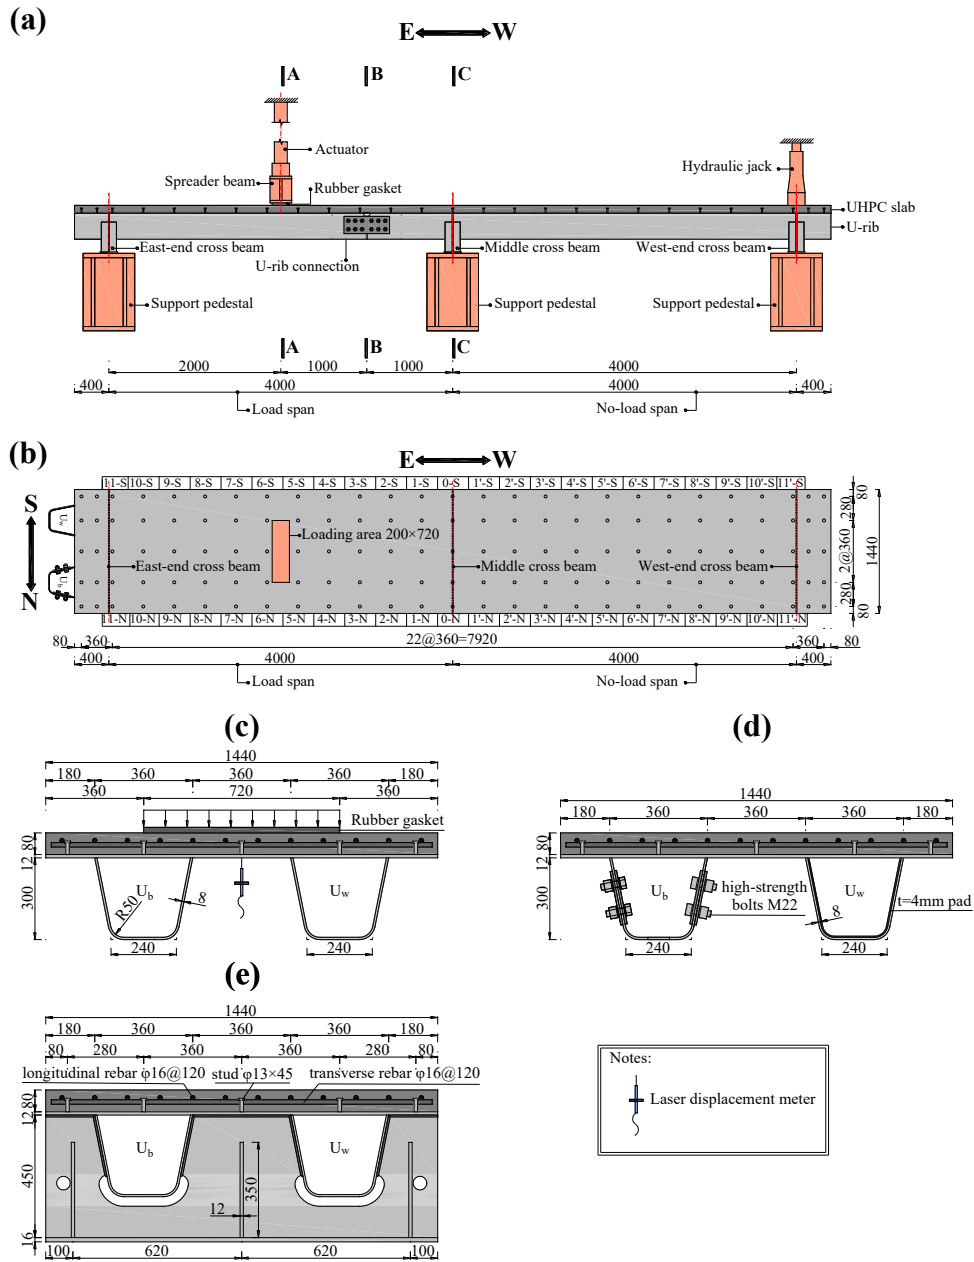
Details of full-scale specimen (unit: mm): (a) elevation view and setup; (b) arrangement of studs; (c) A-A cross section; (d) B-B cross section; (e) C-C cross section.
